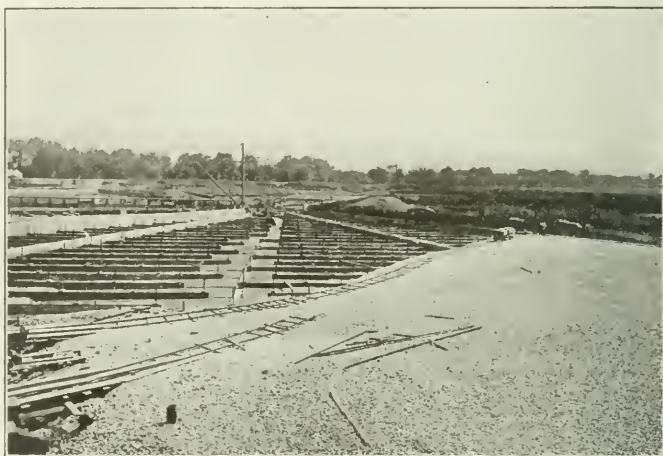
Columbus, O., Sprinkling Filters, Under Construction.
